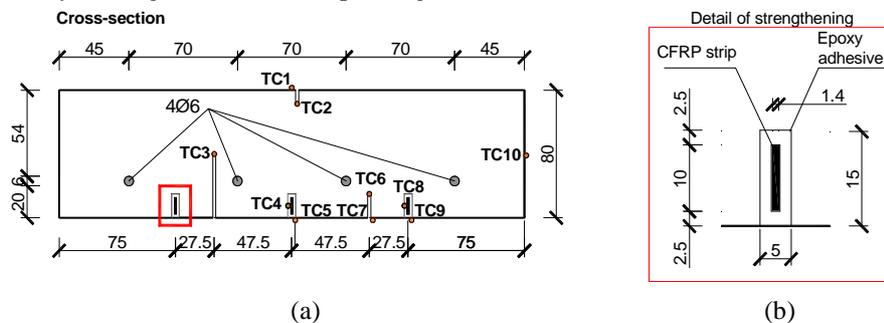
Slab's geometry: (a) cross-section (b) details of the strengthening. [Note: all units are in millimetres]
